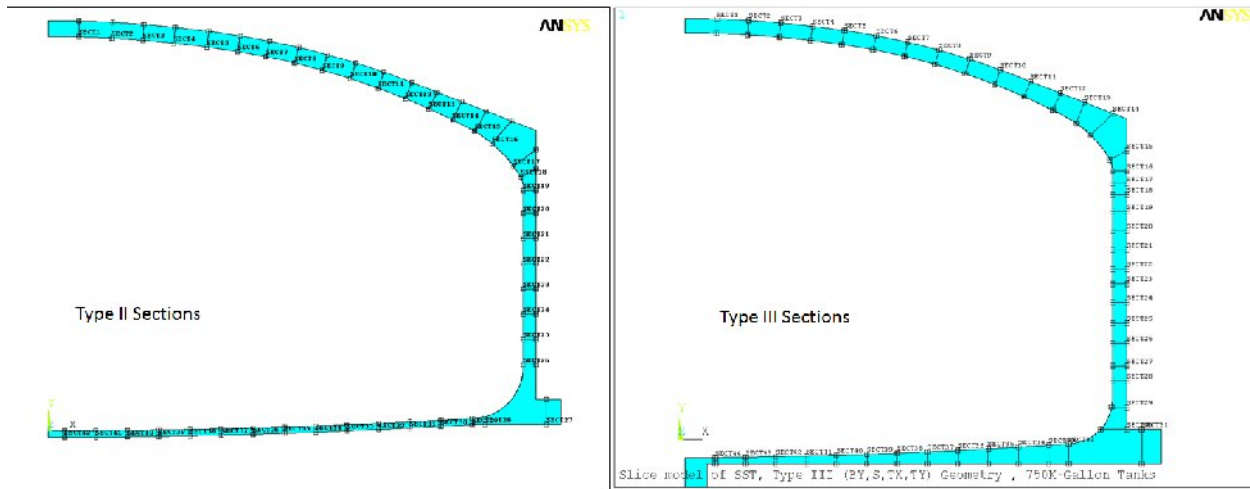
ACI section locations for Type II and Type III tanks. Section numbering starts near the dome apex (Section 1) and follows around the tank section to the center of the floor.
